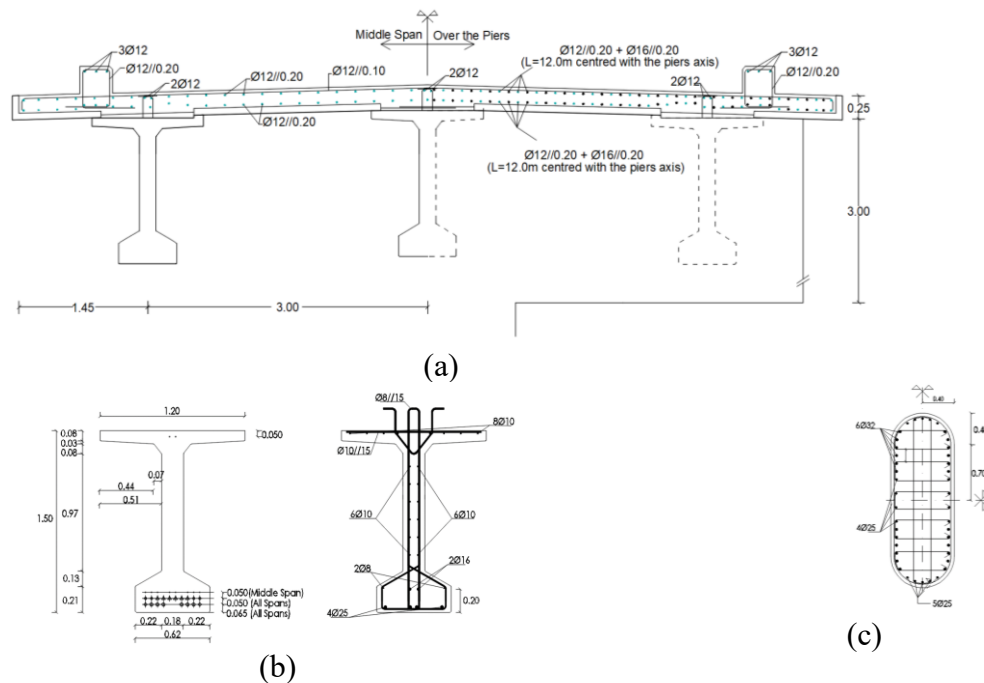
Transversal cross-section and reinforcement layout of (a) deck, (b) girders and (c) columns (measurement unit: meters) [80]
